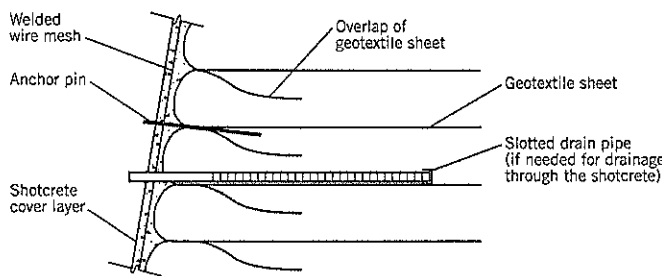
Shotcrete finish for wrap-around fabric wall.
